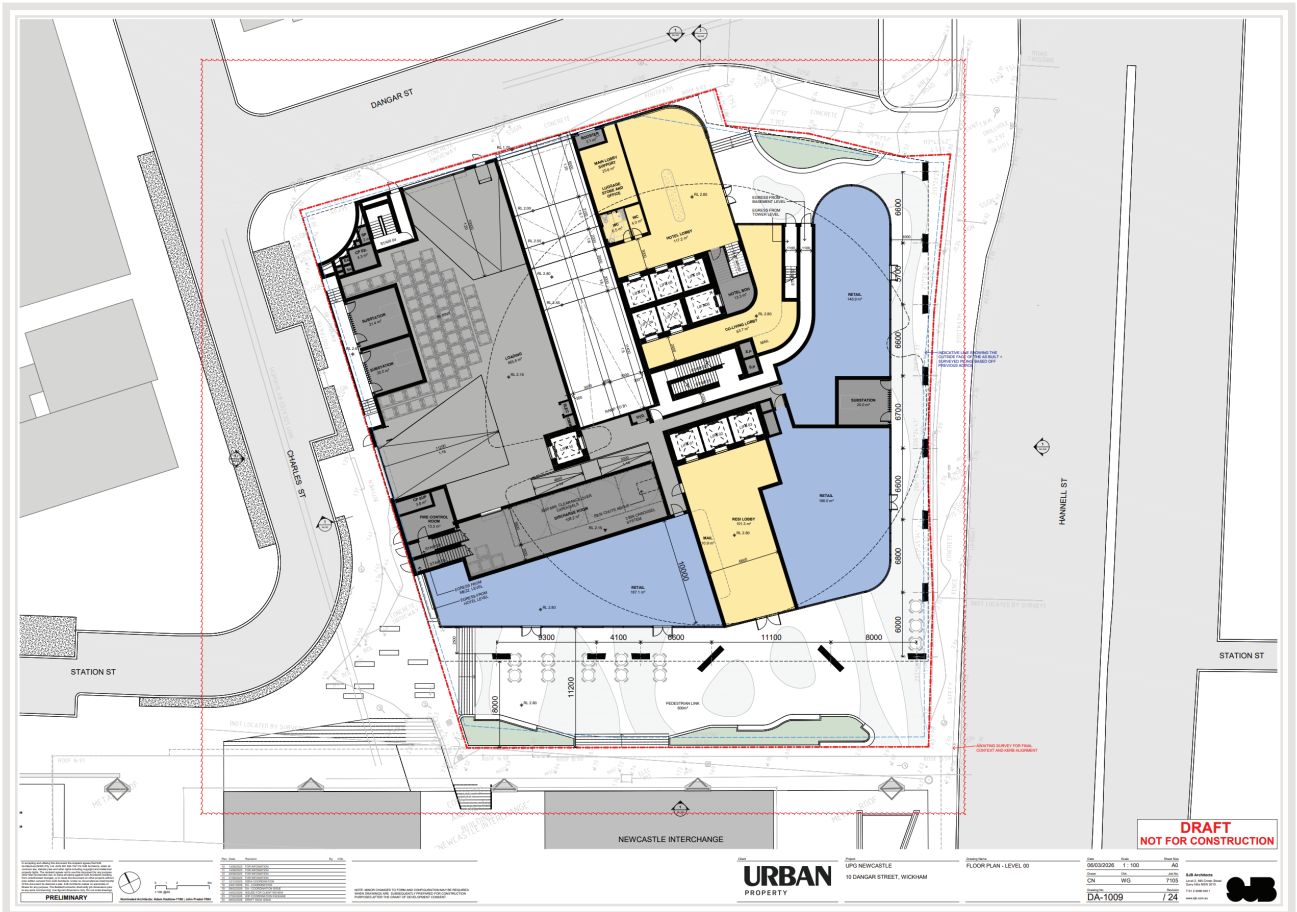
Typical floor plan of the proposed design by SJB Architects.
